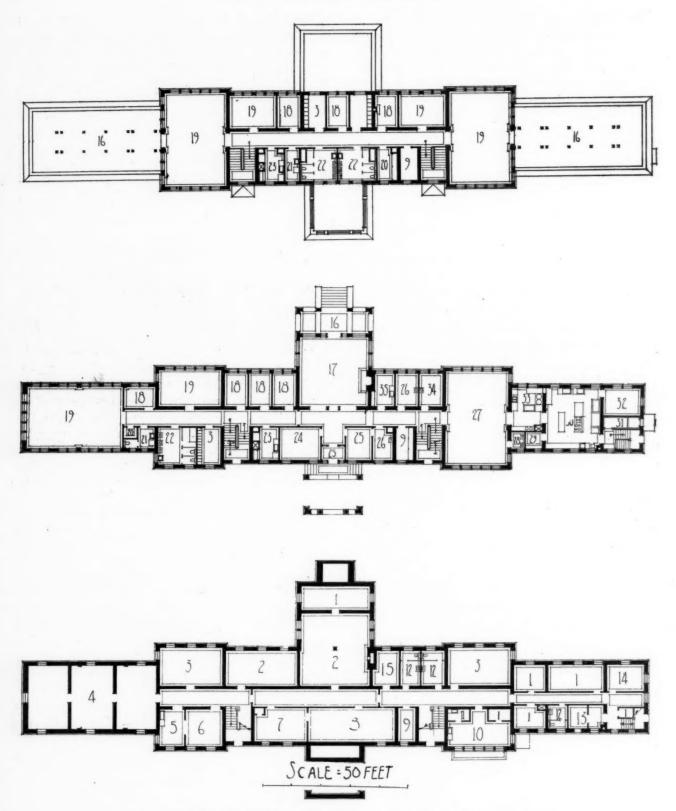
Floor plan of the basement and the first and second floors of the Riverside Sanatorium.
